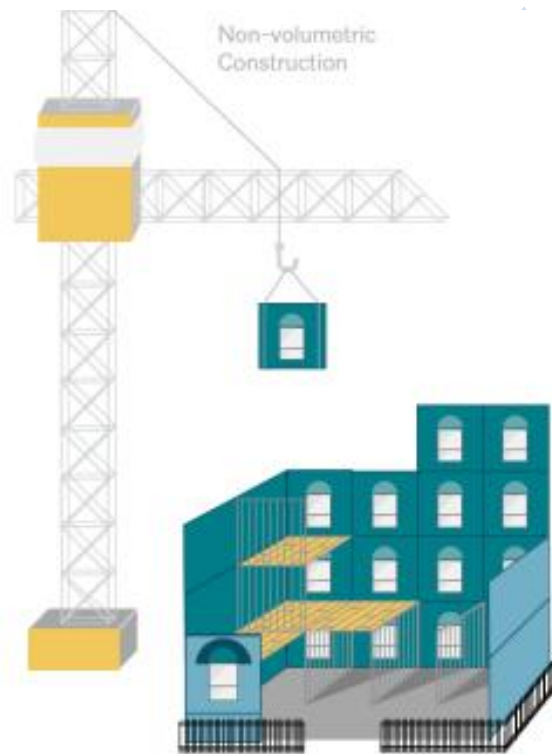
Non-Volumetric construction (Design for Modular Construction)
